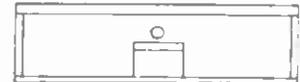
Rawl-sleeve & bolt for concrete floor.
